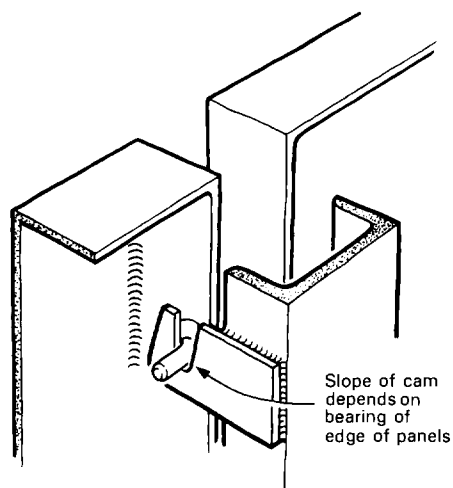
Pin and cam fixings give easy removal of panels for inspection or repair
